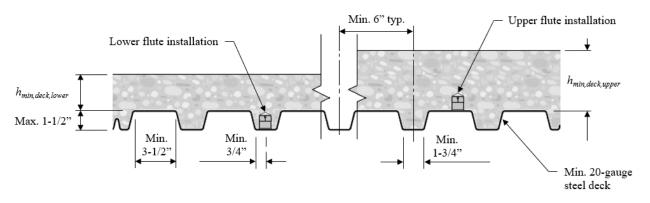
B - HDI-P TZ AND HDI-TZ IN THE SOFFIT OF CONCRETE FILLED PROFILE STEEL DECK ASSEMBLIES - B DECK
